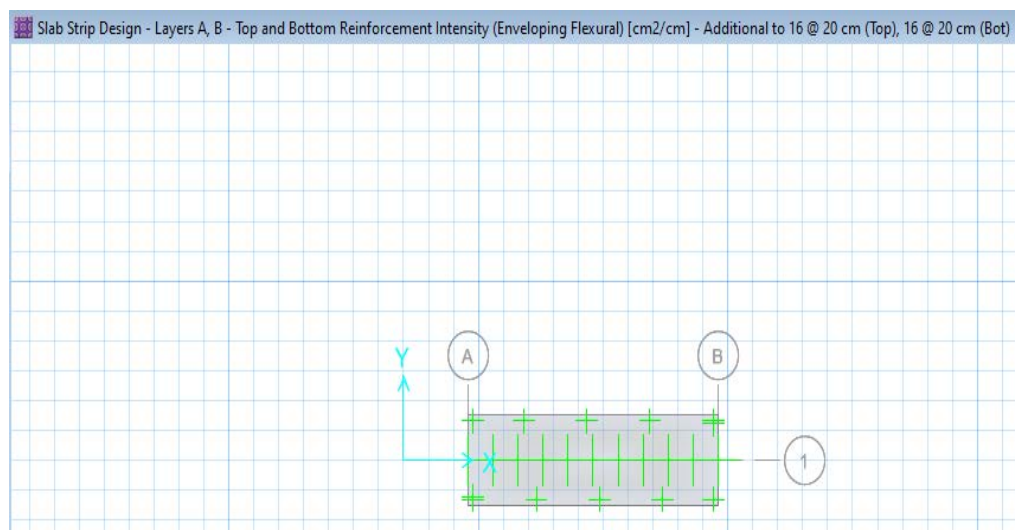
SLAB DESIGN (ADDITIONAL REINFORCEMENT)
